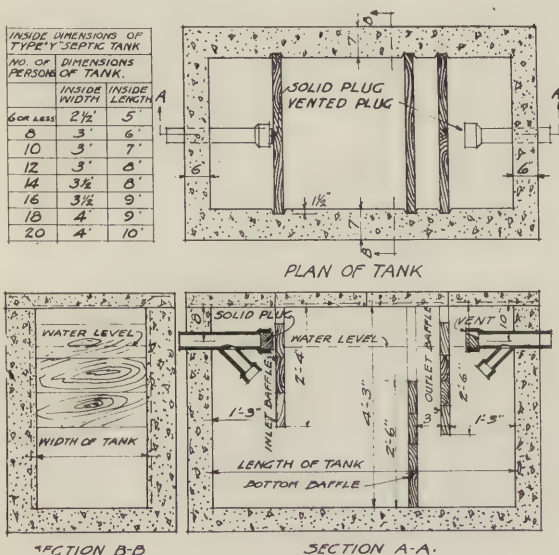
Type Y septic tank as designed by Department of Rural Engineering, N. Y. State College of Agriculture.
